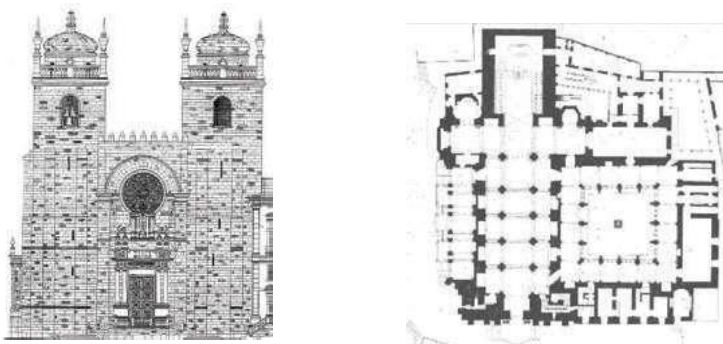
Façade (left) and plan (right) of Porto Cathedral
